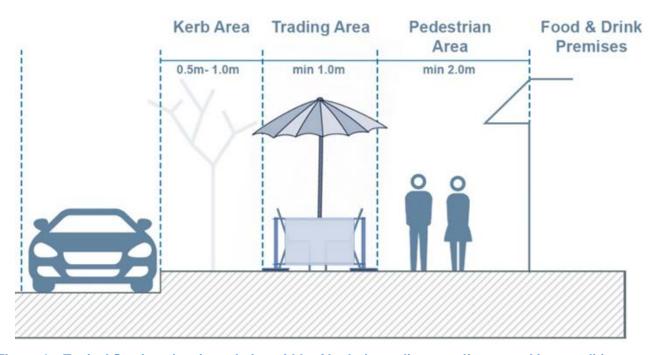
Typical Section showing relative width of kerb depending on adjacent parking condition (Not to Scale)
